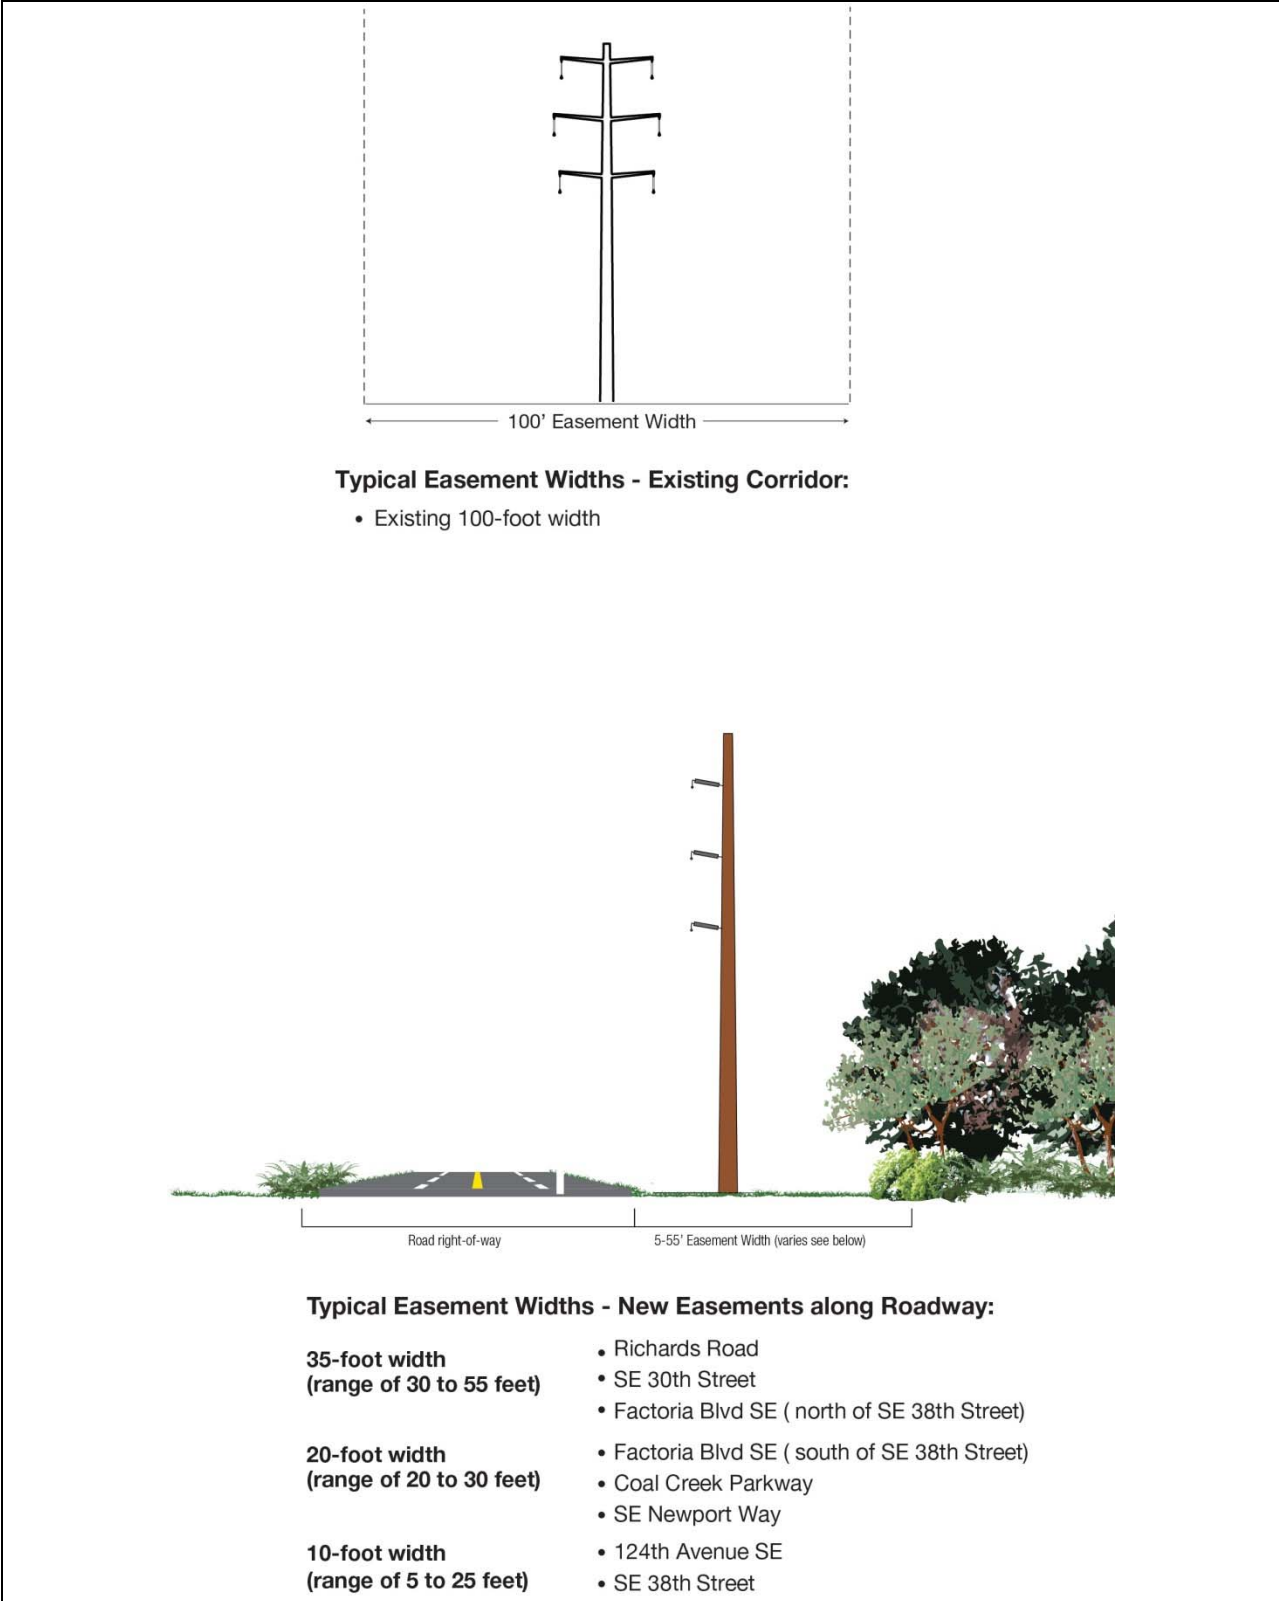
Typical Easement Widths for the Existing Corridor and New Corridor along Roadways (Conceptual).
